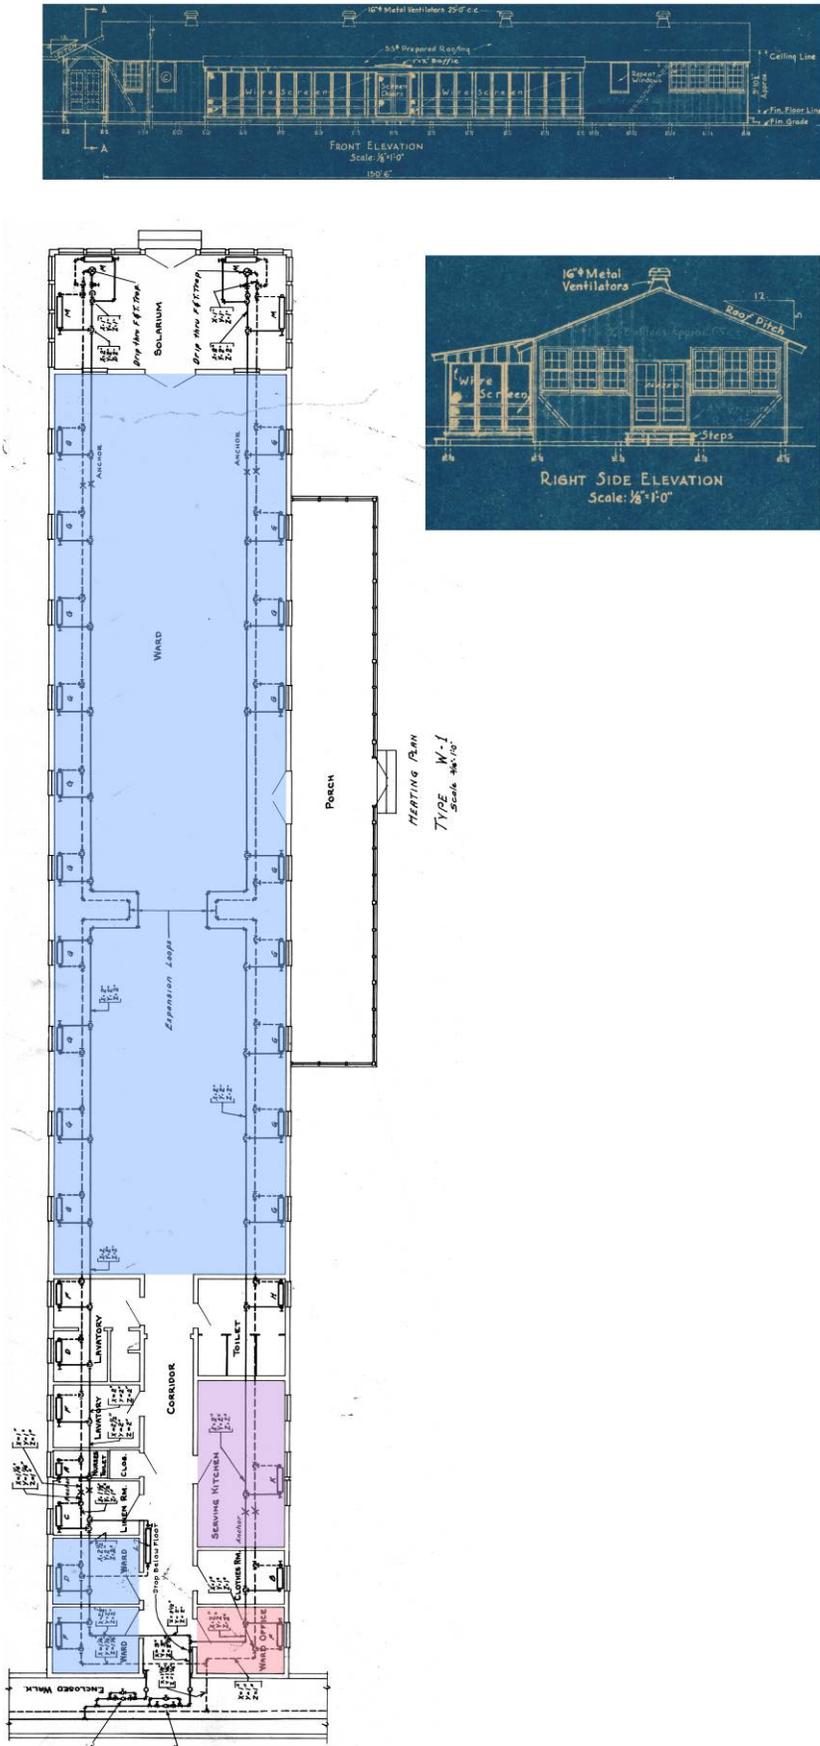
Floor plan and elevations of a typical World War II ward, 1940 (ERDC-CERL).
